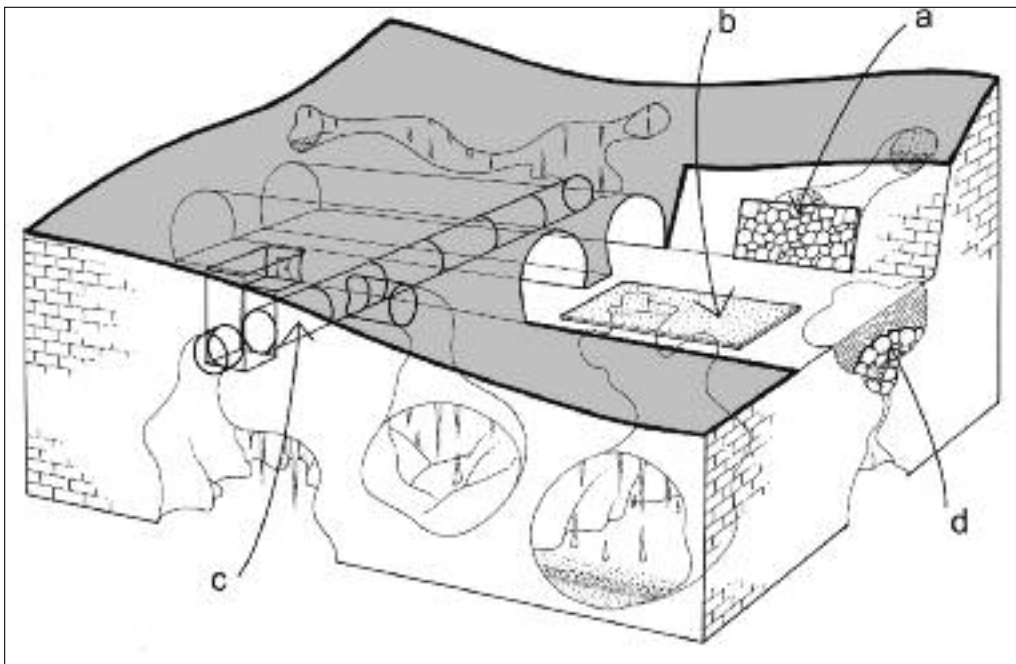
Preservation of caves: a) in road cuts the caves are hidden behind rocky scarps, b) the caves lying below the road with narrow mouth and if their rim is not too much damaged by blasting are covered by concrete lids, c) in the side of the tunnel pipe there is a special door leading to the caves; below traffic belt caves are connected with large concrete pipes, d) karst openings (bottom of dolines, tops of shafts) are often reinforced by arches of big rocks poured over by concrete.
